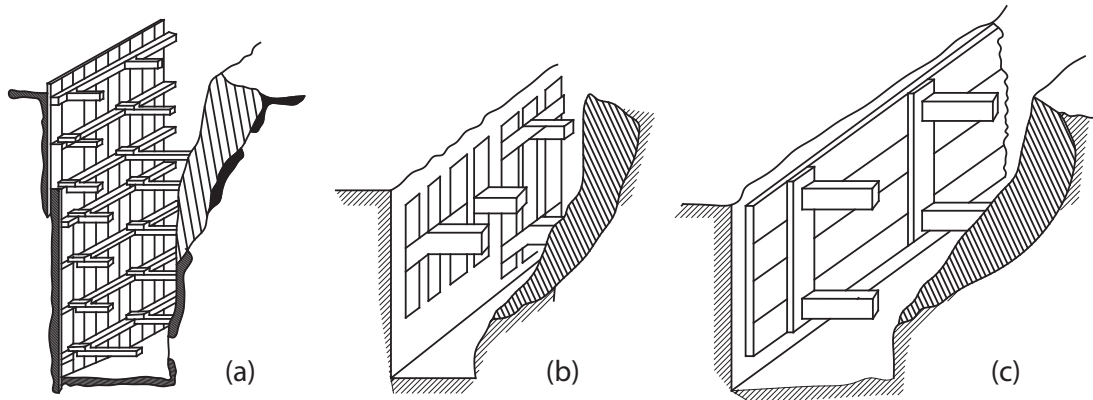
(a) Vertical sheeting; (b) poling boards; and (c) box sheetings for sewer construction.
